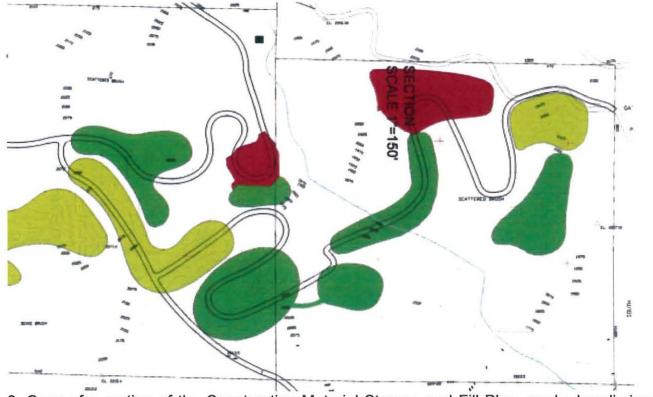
Copy of a portion of the Construction Material Storage and Fill Plan, marked preliminary, showing construction activity already conducted by Mr. Fishback in the Ybarra Creek drainage.
